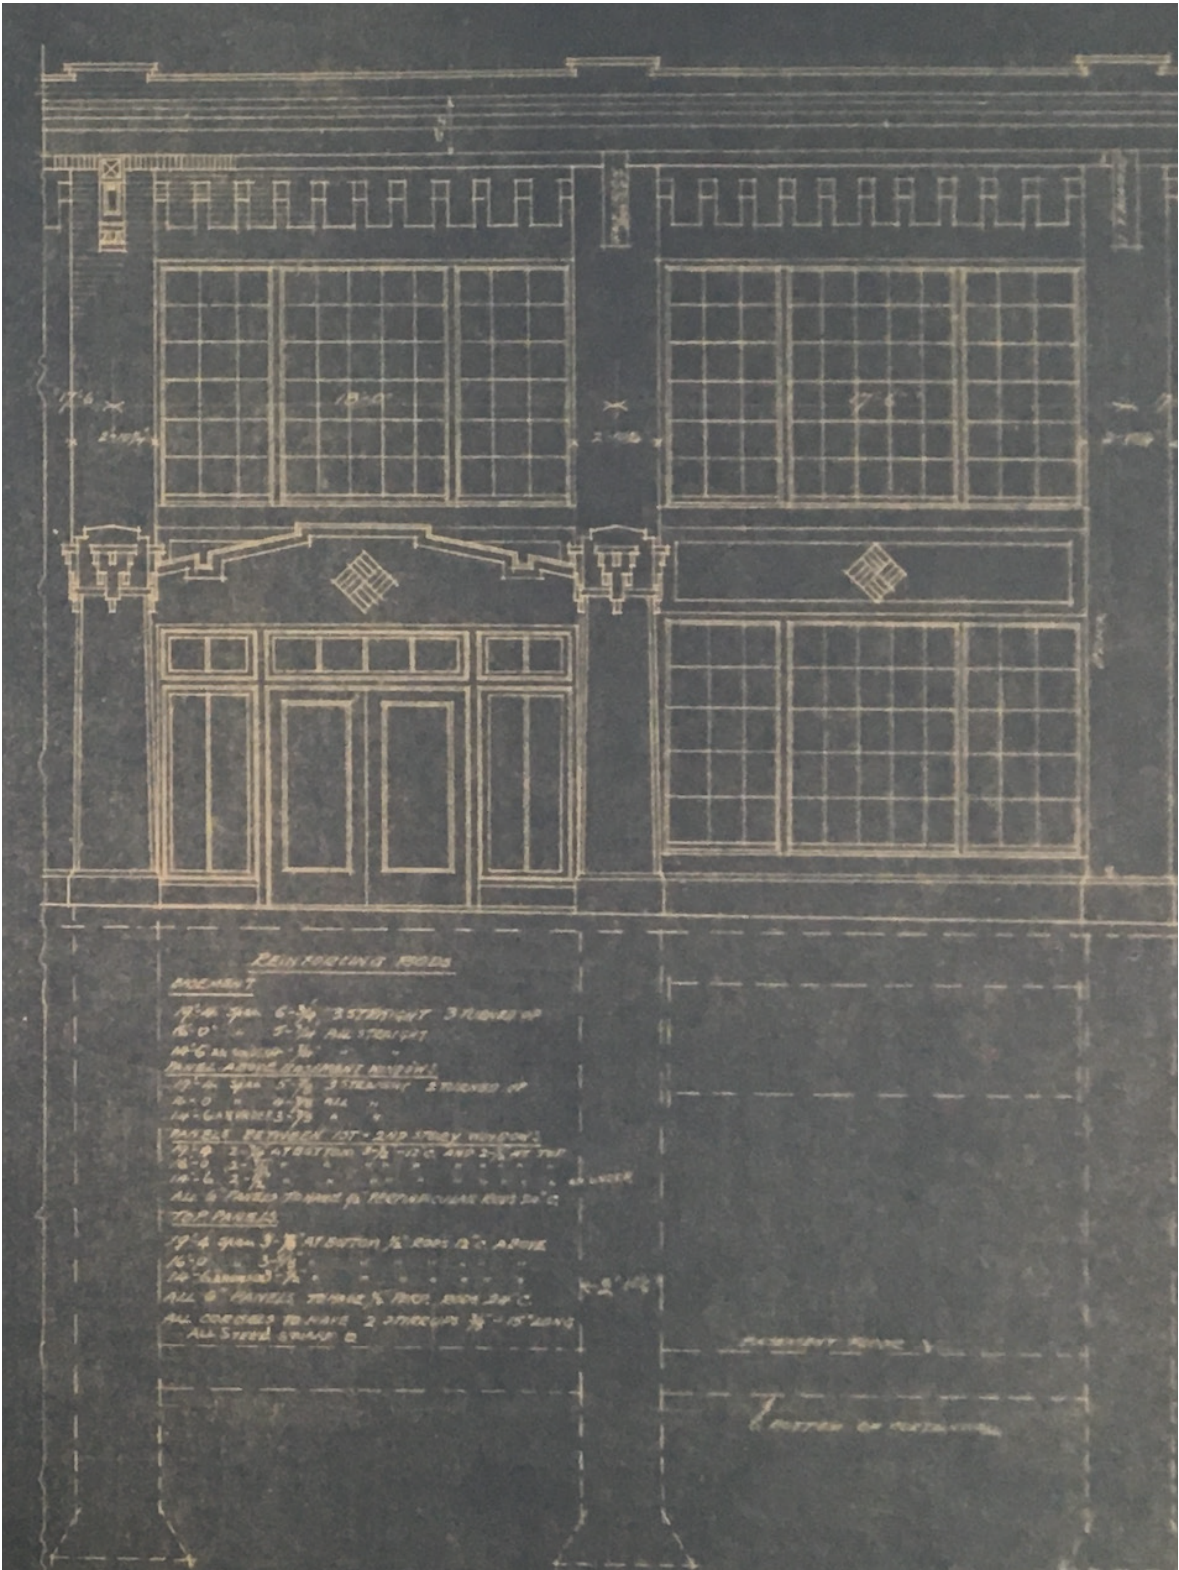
This detail view of a partial elevation at the entry of the Black Manufacturing Building, obtained from the University of Washington Special Collections, indicates structure at the basement and a window well in dashed lines.
